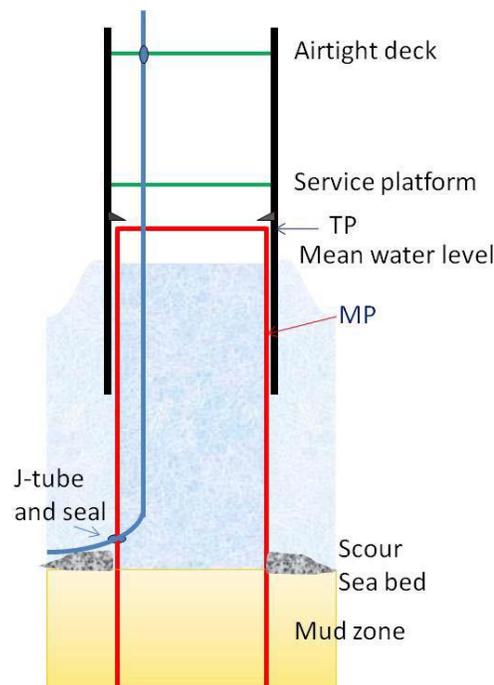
Overview sketch of monopile (MP) foundation design with transition piece (TP) (system with internal J-tube)¹.
